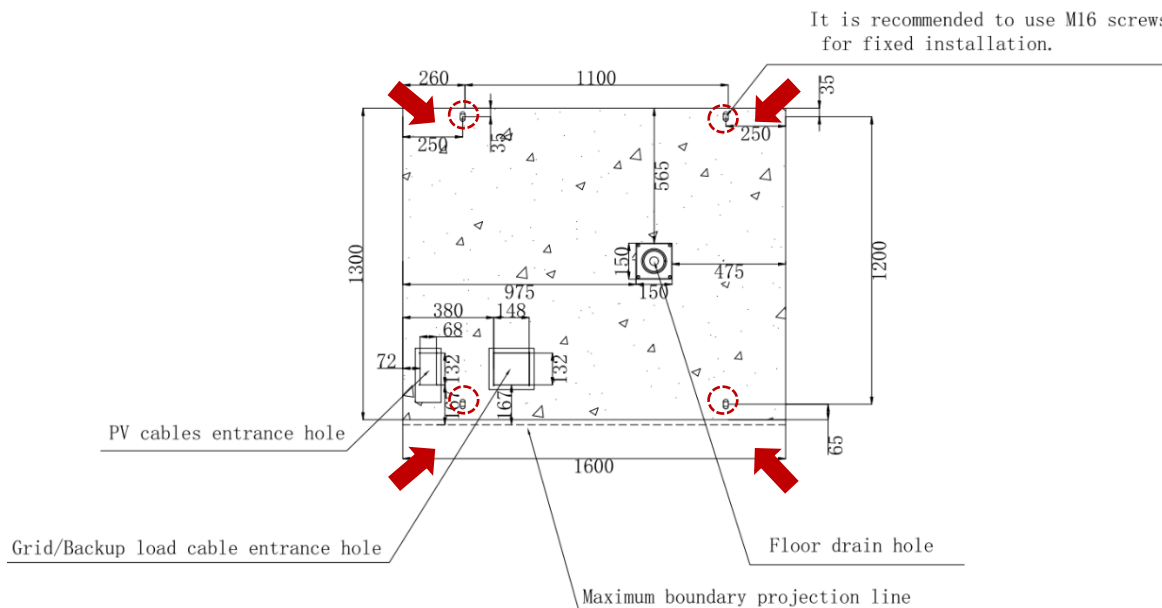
Cabinet fixation guide bottom view Unit: mm
